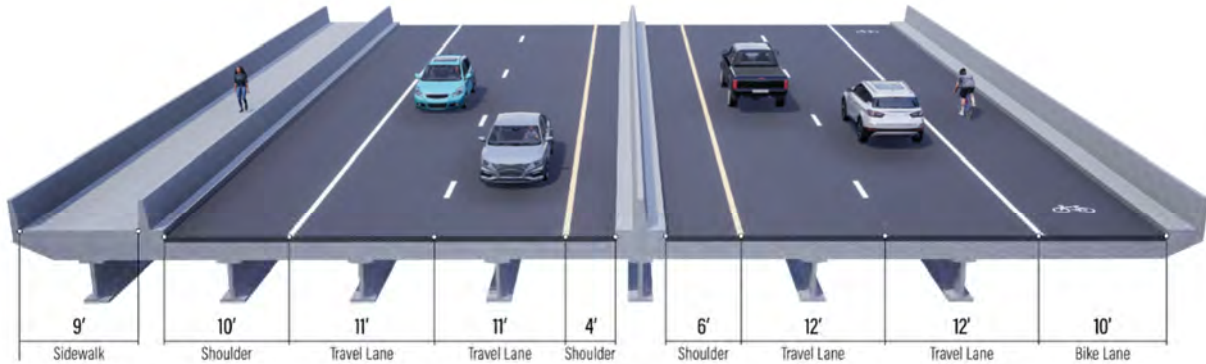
Existing Typical Section 11 - 9th Street from 8th Avenue to the Green Bridge
